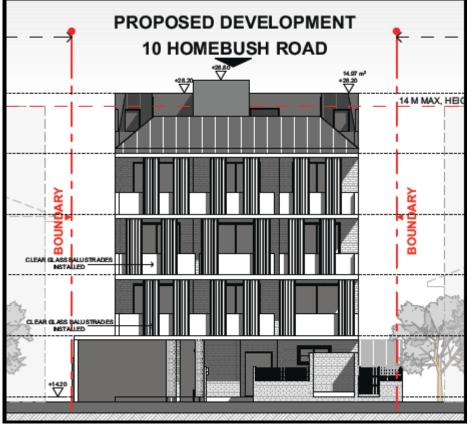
The proposed Western Elevation fronting Homebush Road Private Open Space
